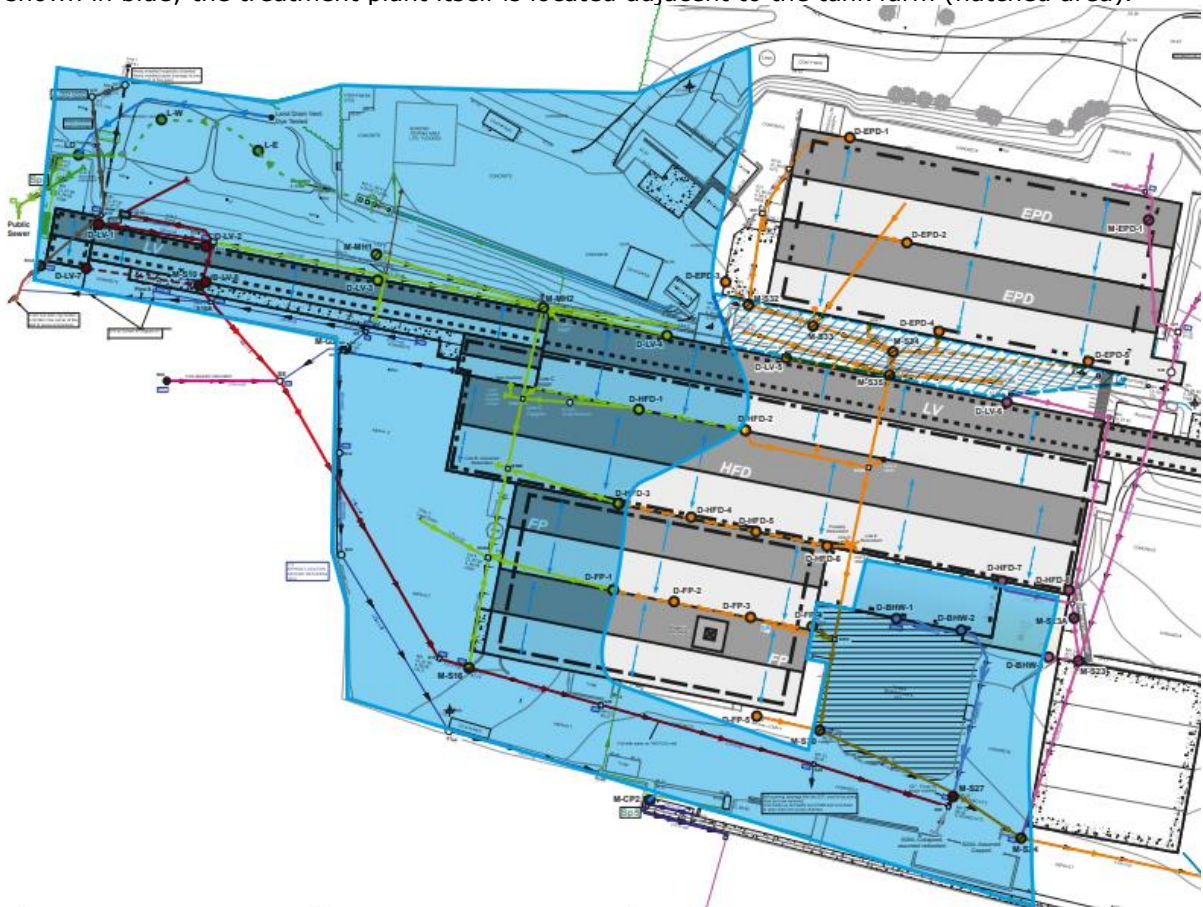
Drainage infrastructure and extent of stormwater collection for treatment
